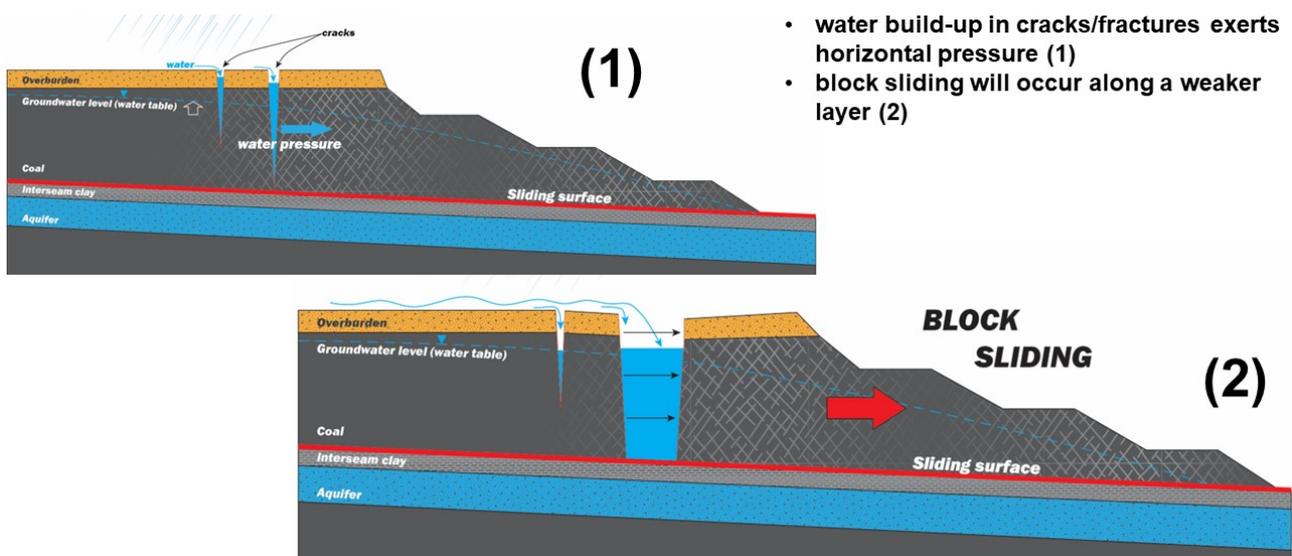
Schematic diagram of a block sliding failure mechanism in coal (courtesy MLRA)
